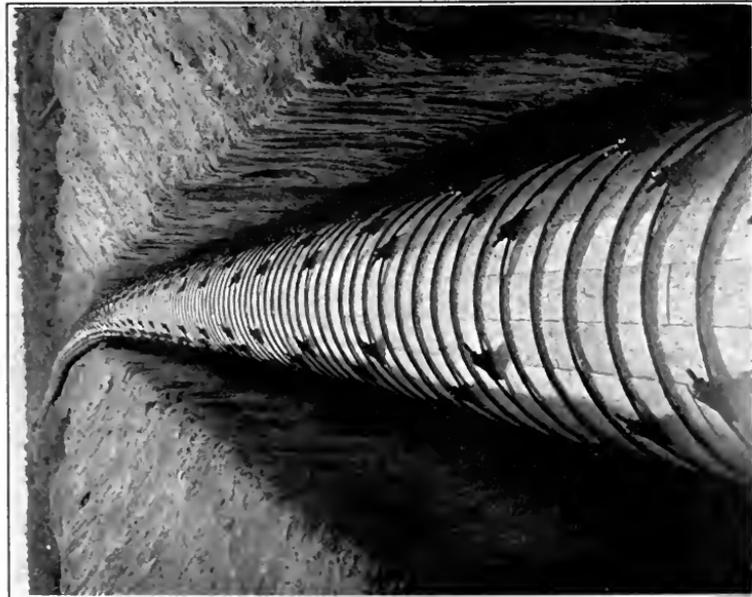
inch continuous wooden stave pipe. Eastern Washington (Washington Pipe & Foundry Co.).
